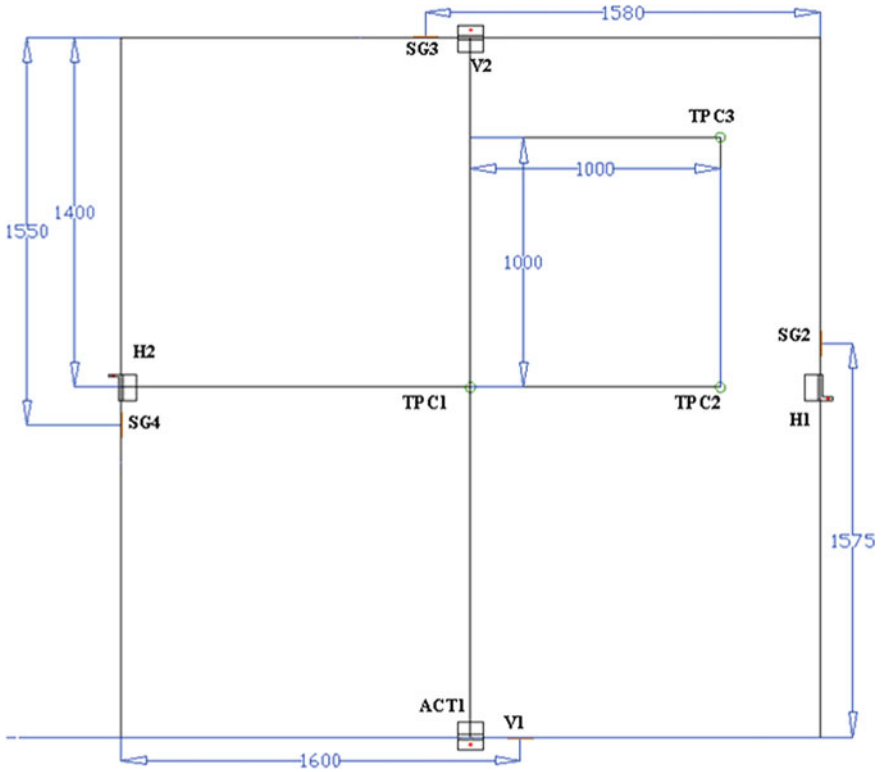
Instrumentation layout for Slab 2 (Top View)
